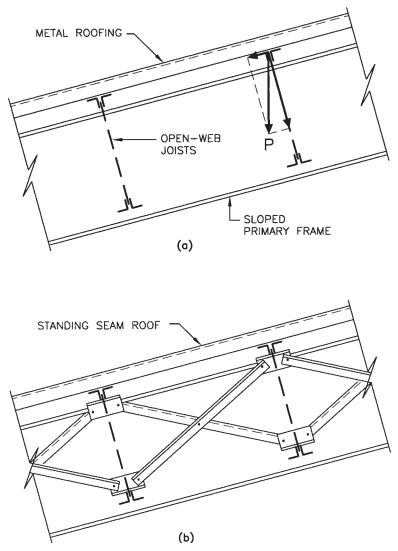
Open-web joists in sloped roofs: (*a*) torsion introduced by slope; (*b*) crossbridging to ensure lateral stability.
